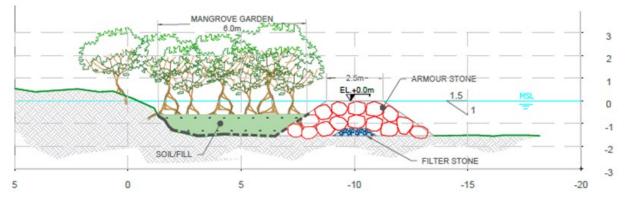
Cross-section through manmade mangrove garden in revetment
